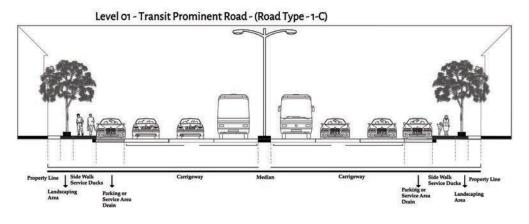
Cross section of a Level 01 – Transit Prominent Road - (Road Type - 1–C)
